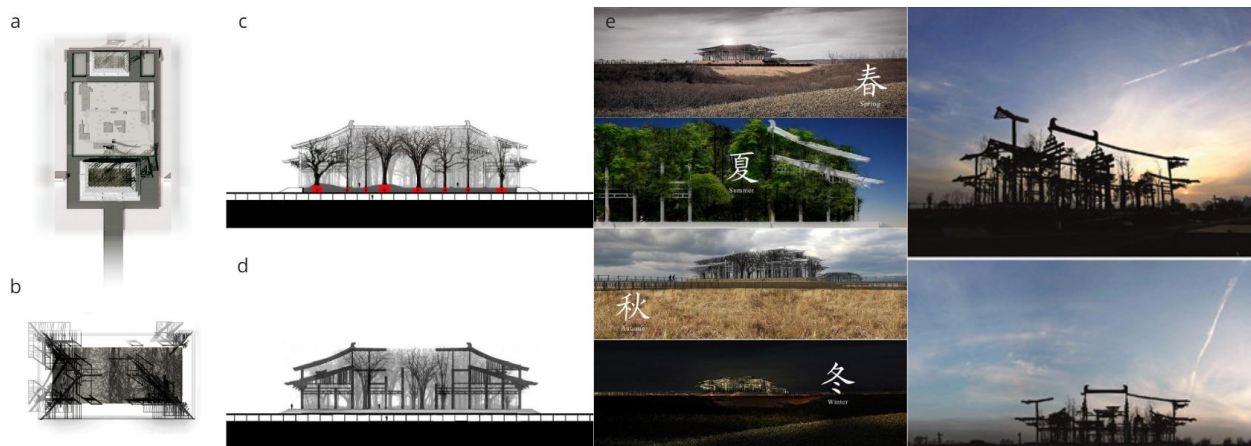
Feng Feng and IAPA Design Consultants, *Palace of Time*, 2010. (a) Site plan overview. (b) Axonometric view of conceptual structure. (c) Front elevation. (d) Side elevation. (e) Renderings depicting the installation across the four seasons, illustrating the project's concept. Spatial experimental art installation for the Xuan Zheng Hall and Zi Chen Hall, National Heritage Park of Tang Xi'an Daming Palace. Source: IAPA Design Consultants (https://www.iapa.net.au/images/projects/2010_XA_XZD.php) © 2025 Feng Feng and IAPA Design Consultants
